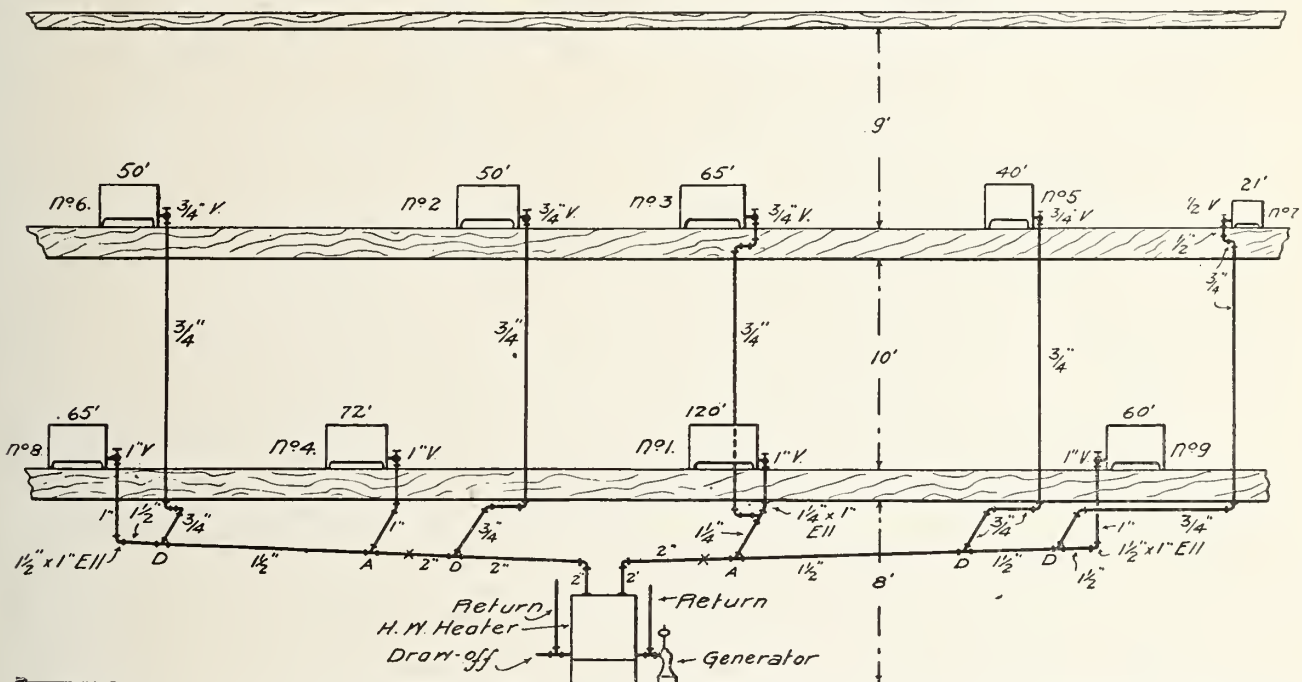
Outline of piping in medium-sized house of which the first and second floors are to be heated with accelerated hot water.
